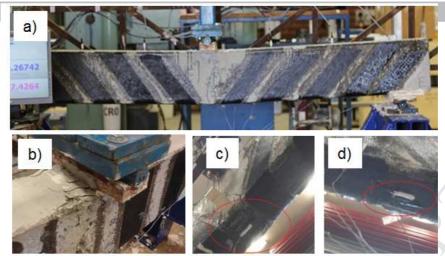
(a) Failure mode of Beam B150C; (b) Compressive failure of concrete at loading plate; (c) Complete BFRP rupture at mid-span; (d) Partial BFRP rupture at SGE3
